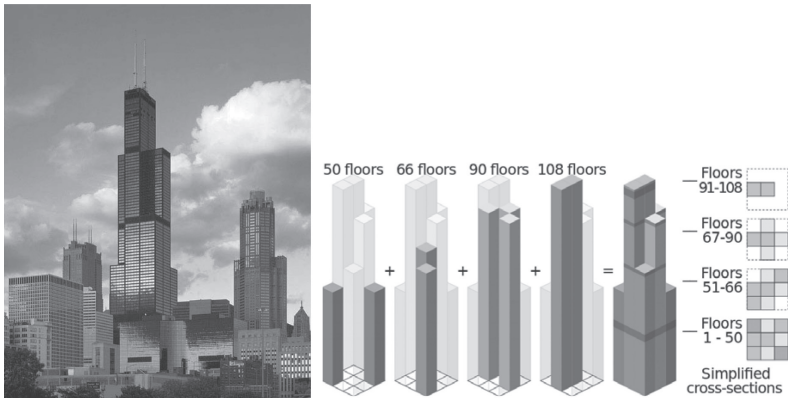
The Sears Tower (Left), Tube Structure with Simplified Floor Plans (Right)
